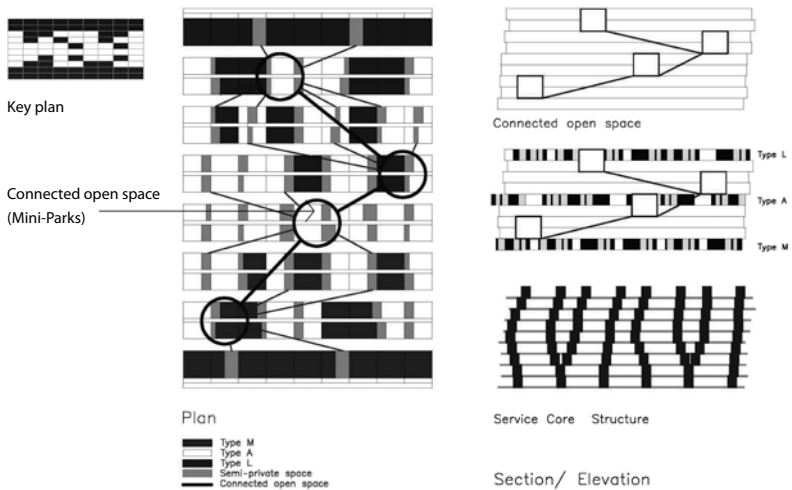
Left: superimposition of linkage layer on base plan. Right: elevation and construction system.
